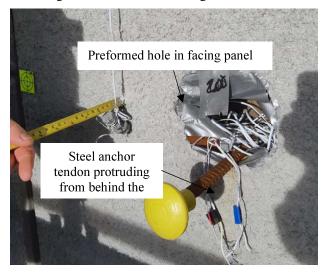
Anchor tendon protruding at face of wall through preformed hole in facing panel.
